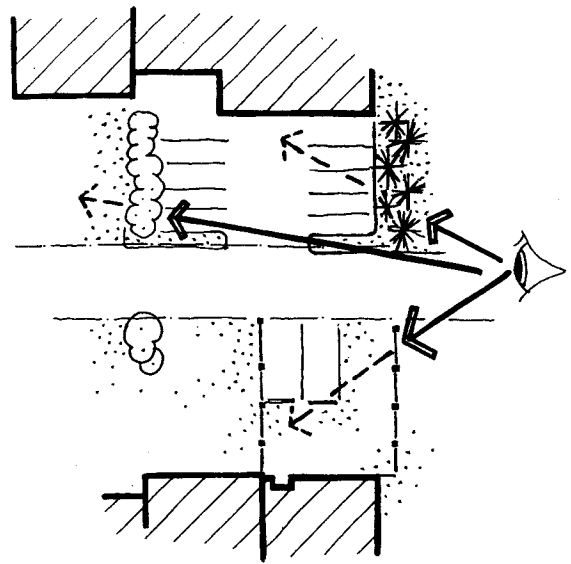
Screen laneway views of parking, storage and equipment.
